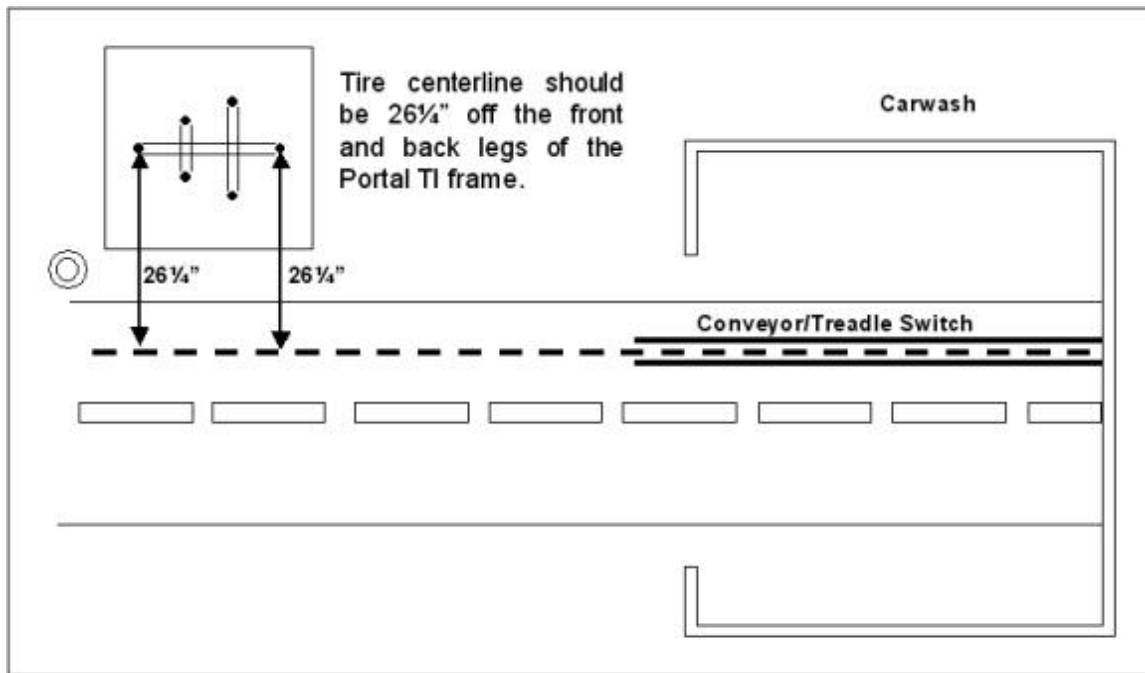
Positioning the Frame - Brick-in Installation, New Slab
